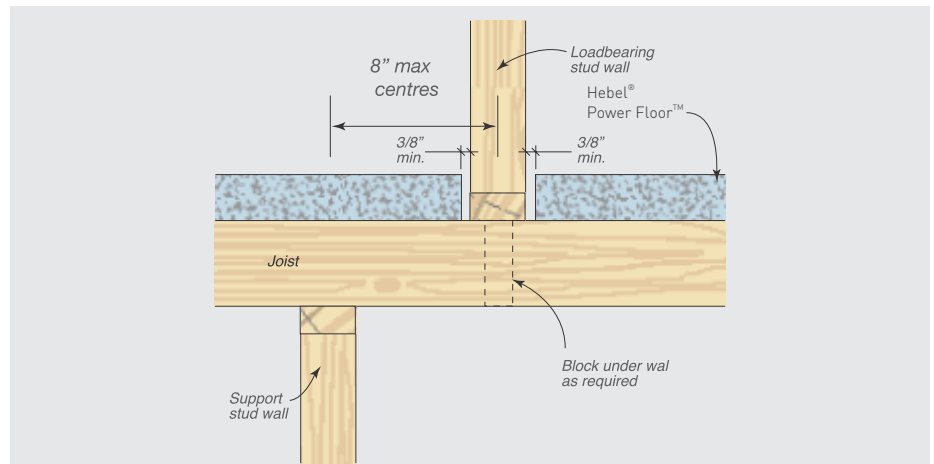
Fitted Flooring with Internal Loadbearing Wall.
